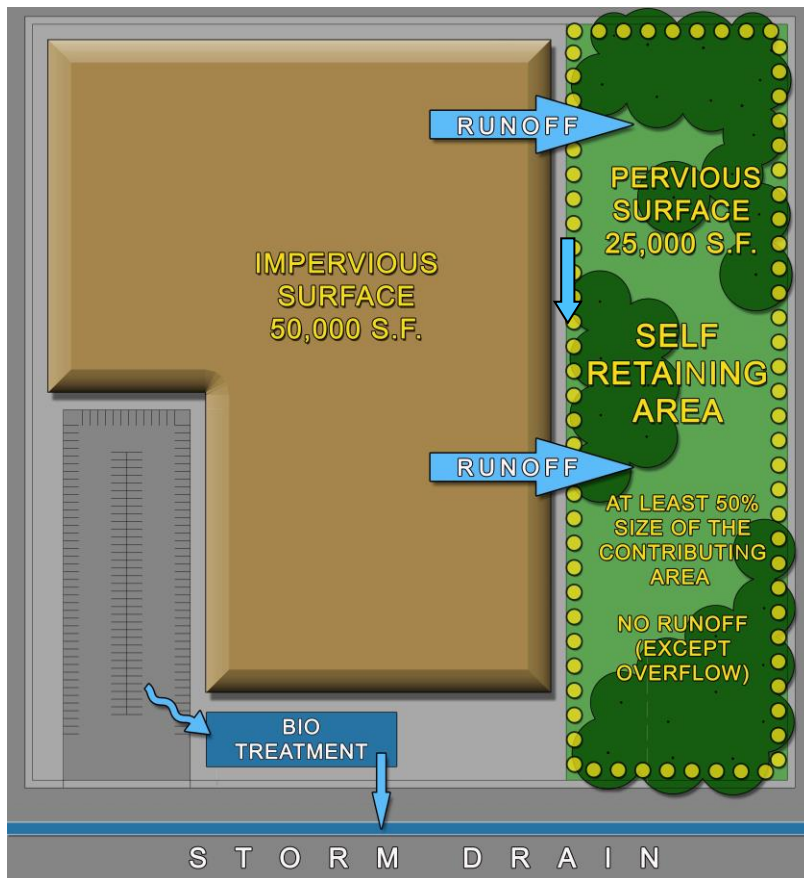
Schematic Drainage Plan for Site with a Self-Retaining Area (Credit: SCVURPPP)
